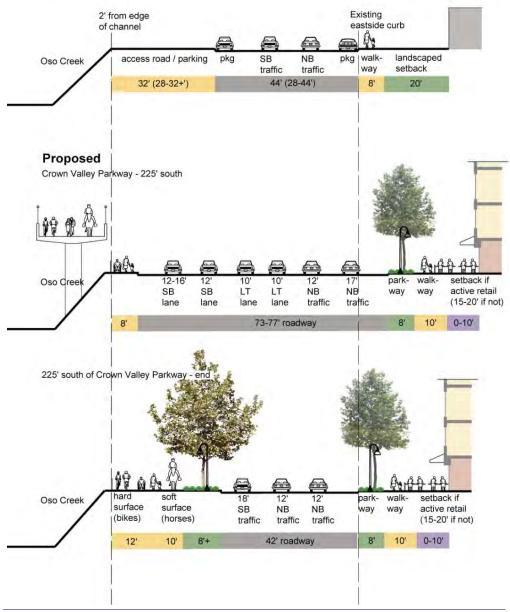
B Forbes Road, South of Crown Valley Parkway: Cross Sections—Looking North
